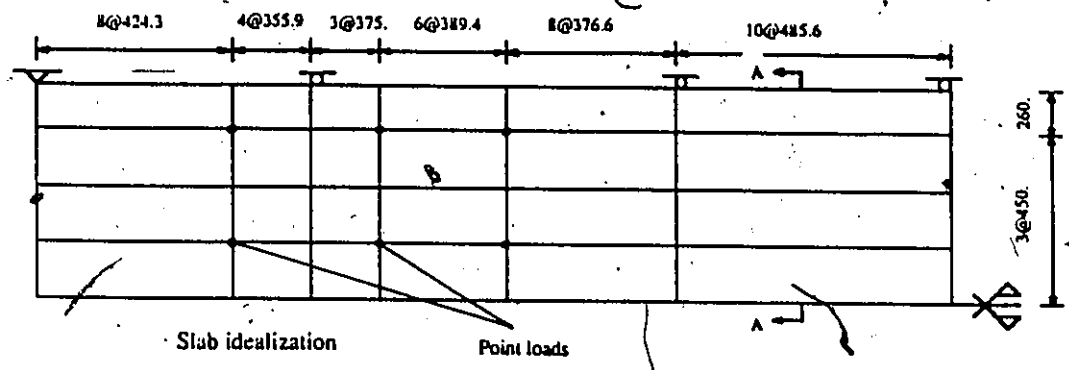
Finite Element Idealization of the S.S. Slab-on-Girder Bridge
